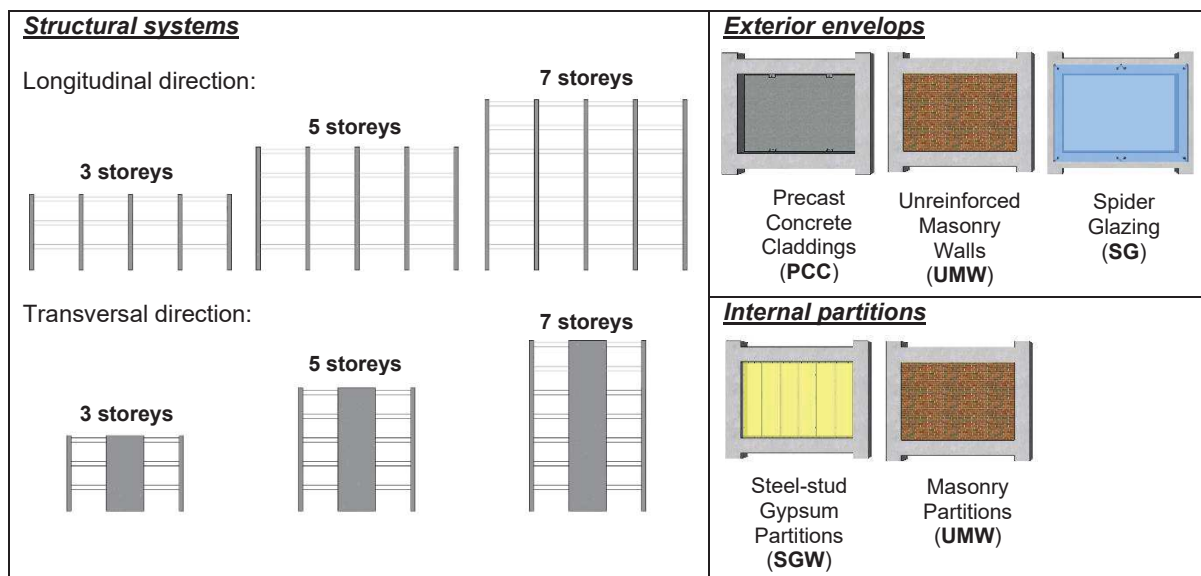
Structural systems (longitudinal views) and non-structural configurations (exterior enclosures, partitions) of the case-study buildings.
